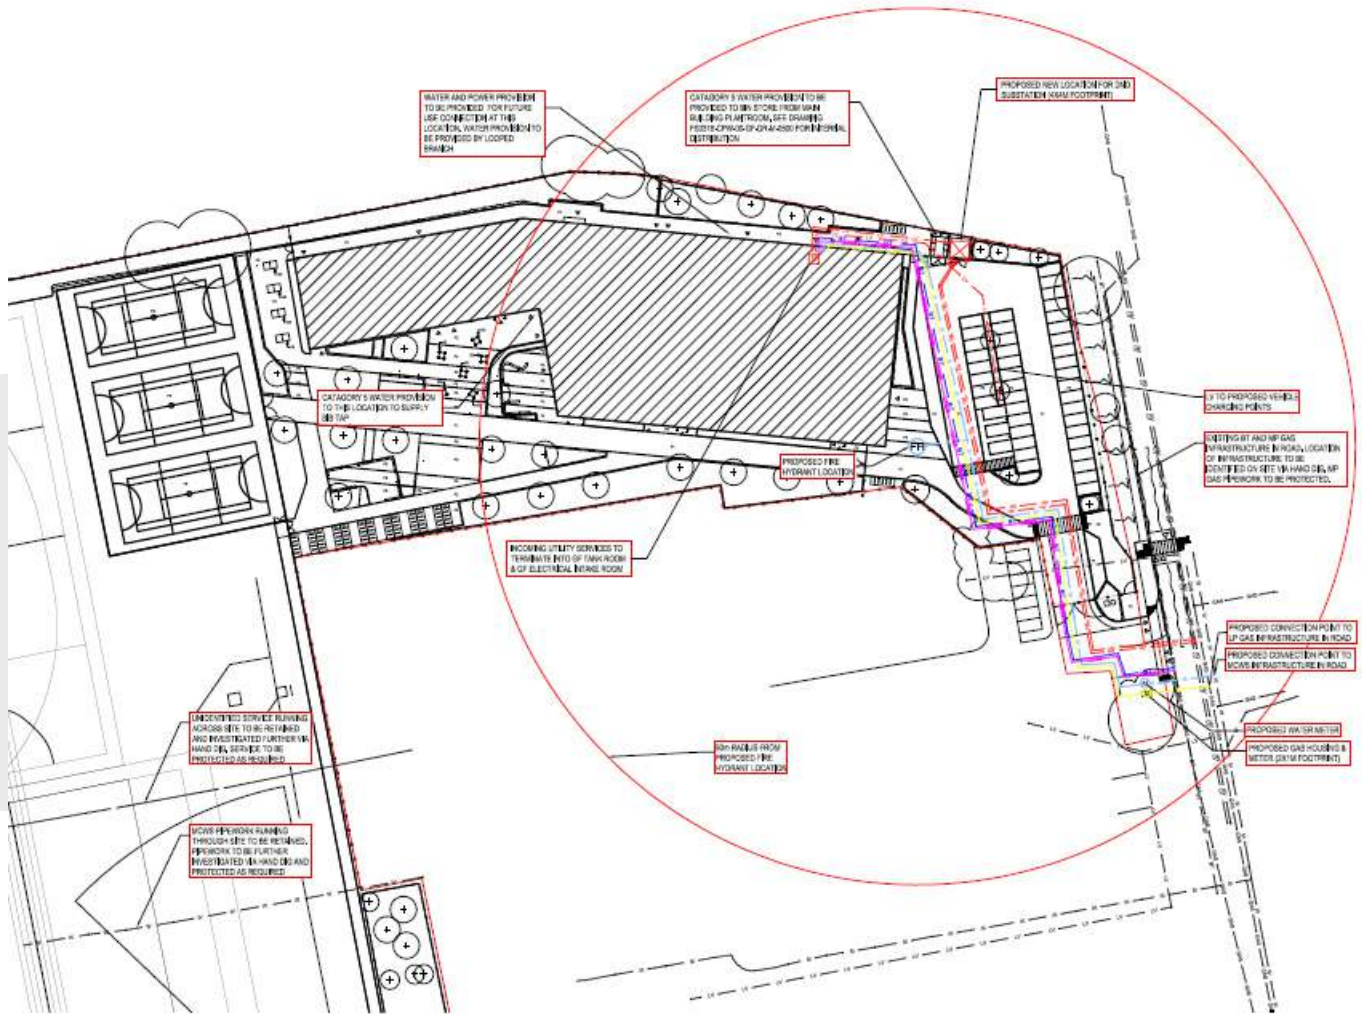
External Services plan showing Site Wide Heat Network – Turing House School
